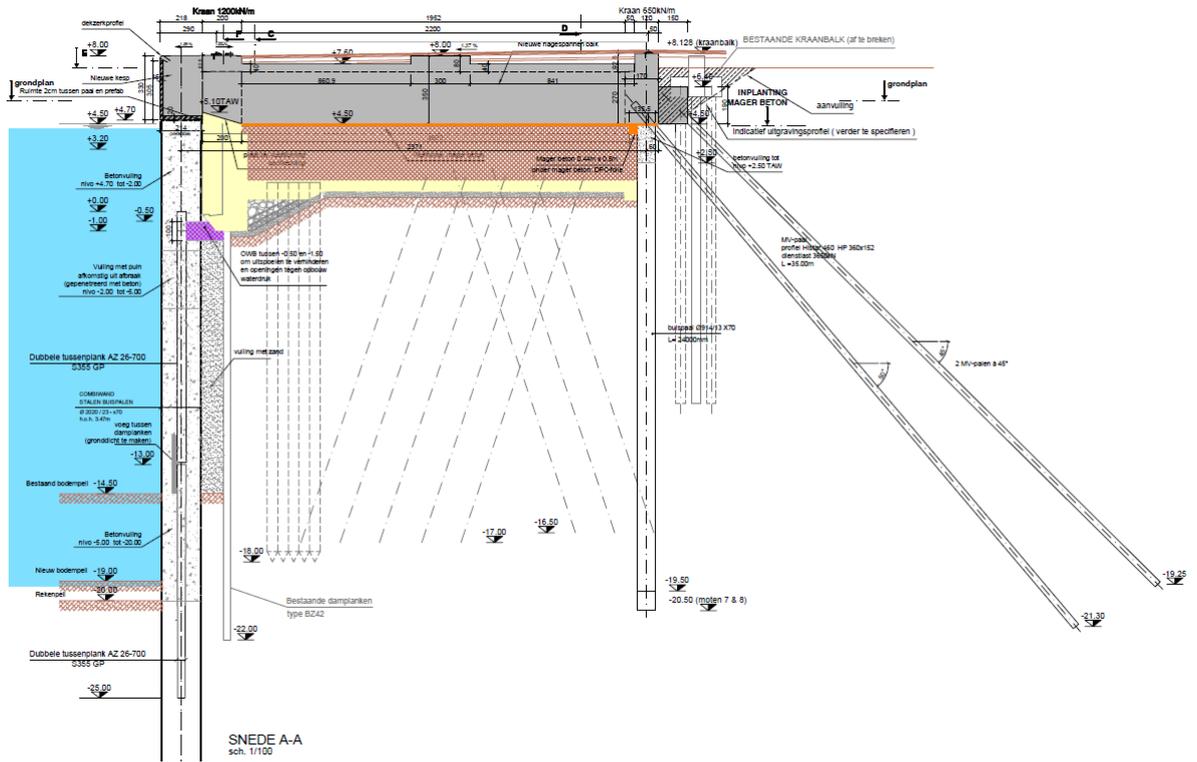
Port of Zeebrugge – CHZ site – reinforced quay wall (source: Technum)
